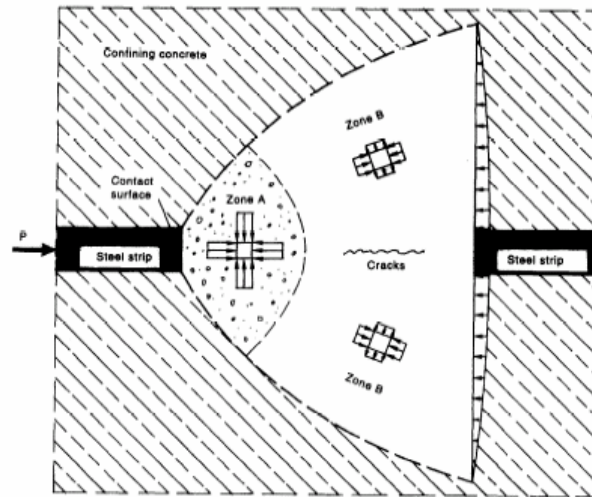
Loading of concrete dowel (Kraus and Wurzer 1997b)
